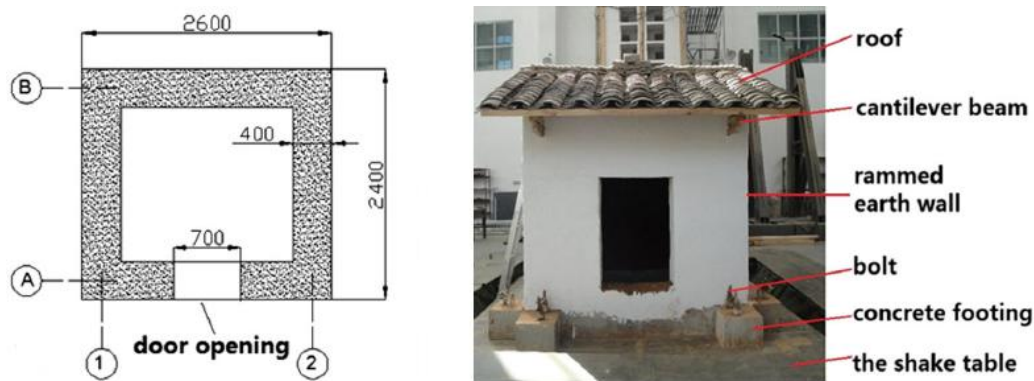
Plan view and constructed rammed earth model to be tested on shaking table (Wang *et al.*, 2016)
